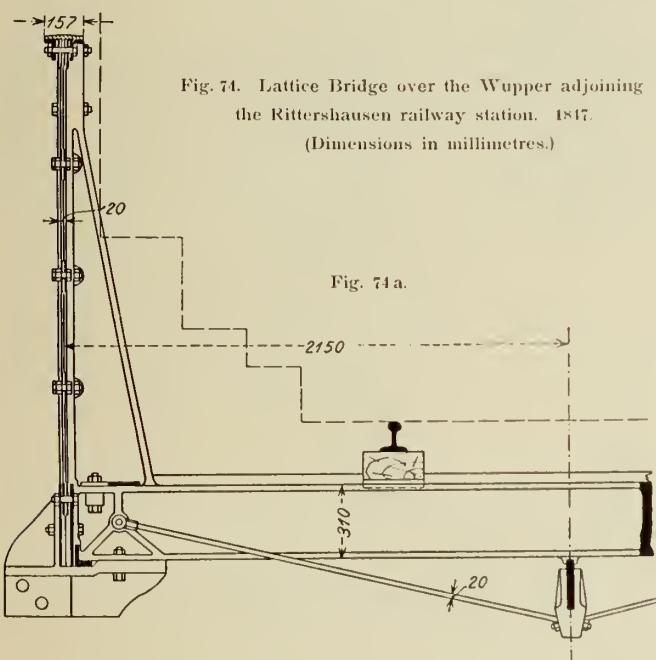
Lattice Bridge over the Wupper adjoining the Rittershausen railway station. 1847. (Dimensions in millimetres.)
